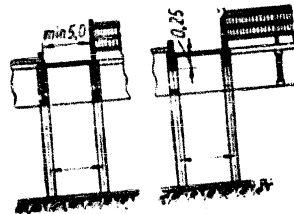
Schemes of Reinforced-Concrete Fire-Protective Zones
